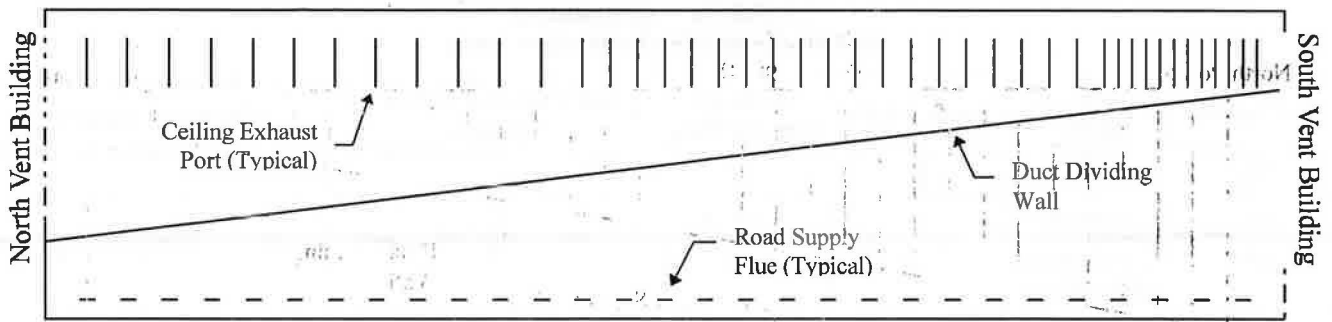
Plan view of the original Memorial Tunnel duct and ceiling.
